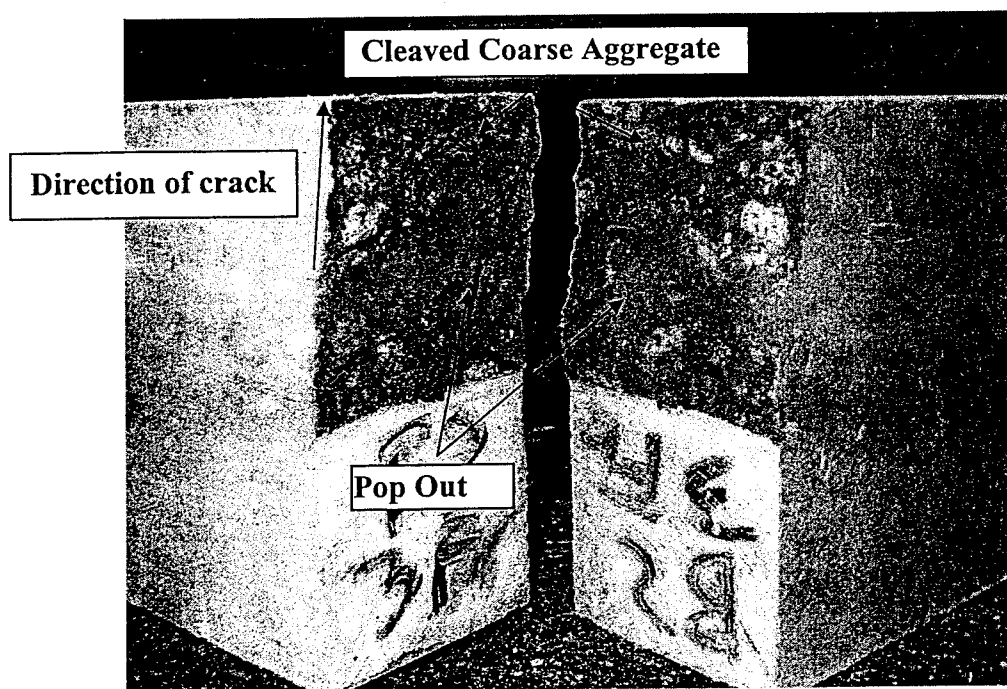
Fracture specimen showing cleaved aggregate and pop out.
